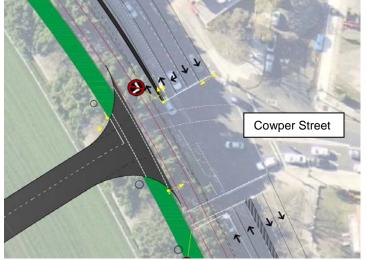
ATC alternative design solution for a new Cowper Street / Alison Road Intersection for heavy vehicle access for Gate 7A (Source: ATC)
